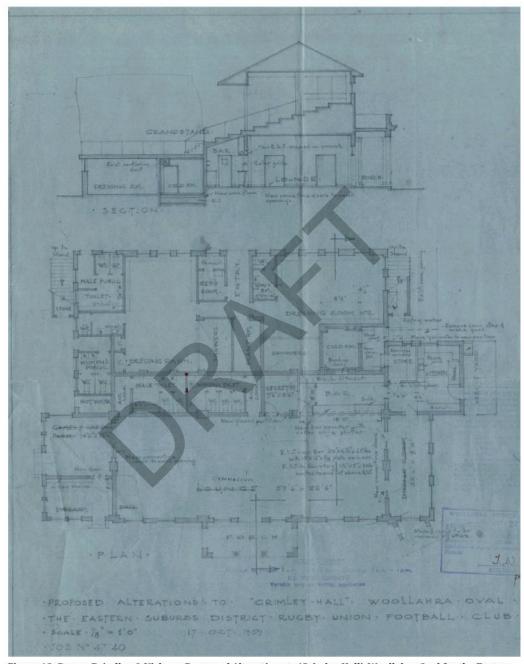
Davey, Brindley & Vickery, Proposed Alterations to 'Grimley Hall', Woollahra Oval for the Eastern Suburbs District Rugby Union Football Club, 1959 (Detail only).
